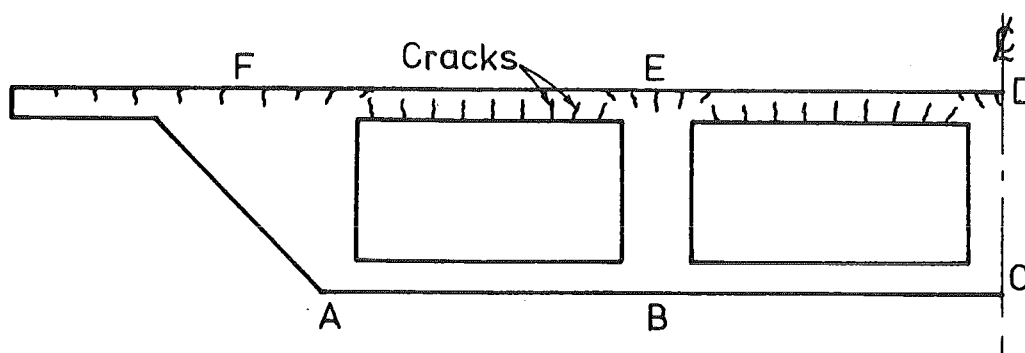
ASSUMED DECK SLAB CRACK DISTRIBUTION IN PORIRUA STATION OVERBRIDGE
